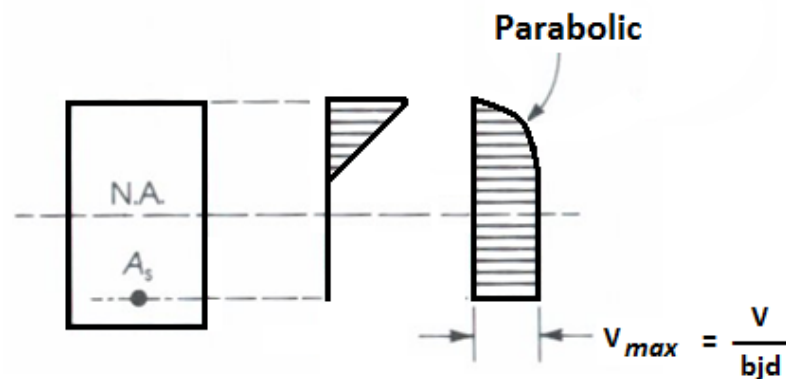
Stress distribution in a reinforced concrete beam containing flexural cracks
